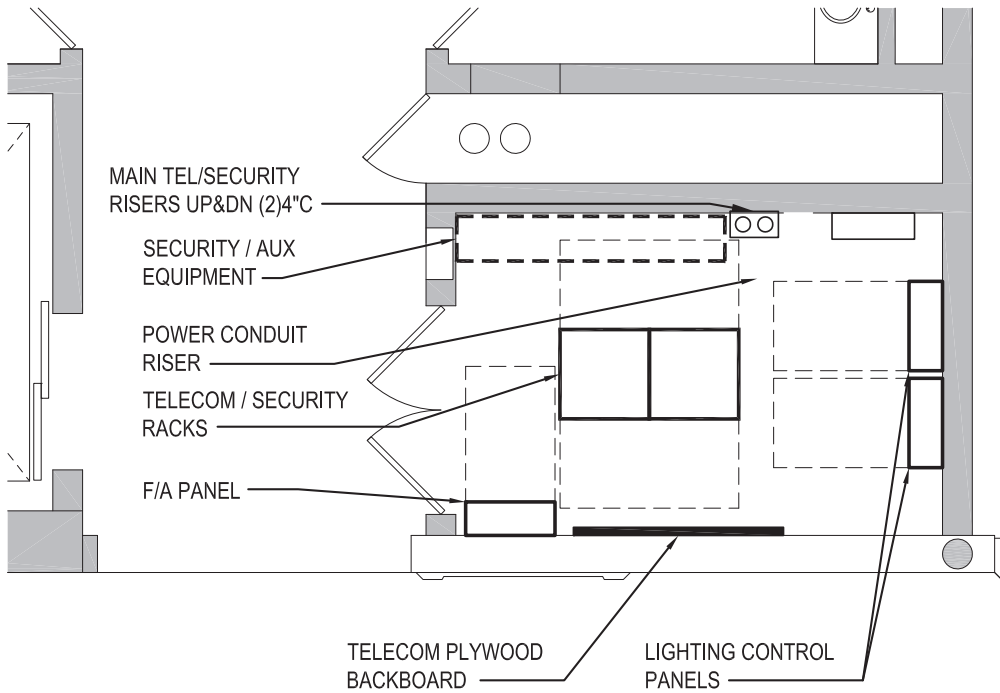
Capitol Building Typical Telecom Room
